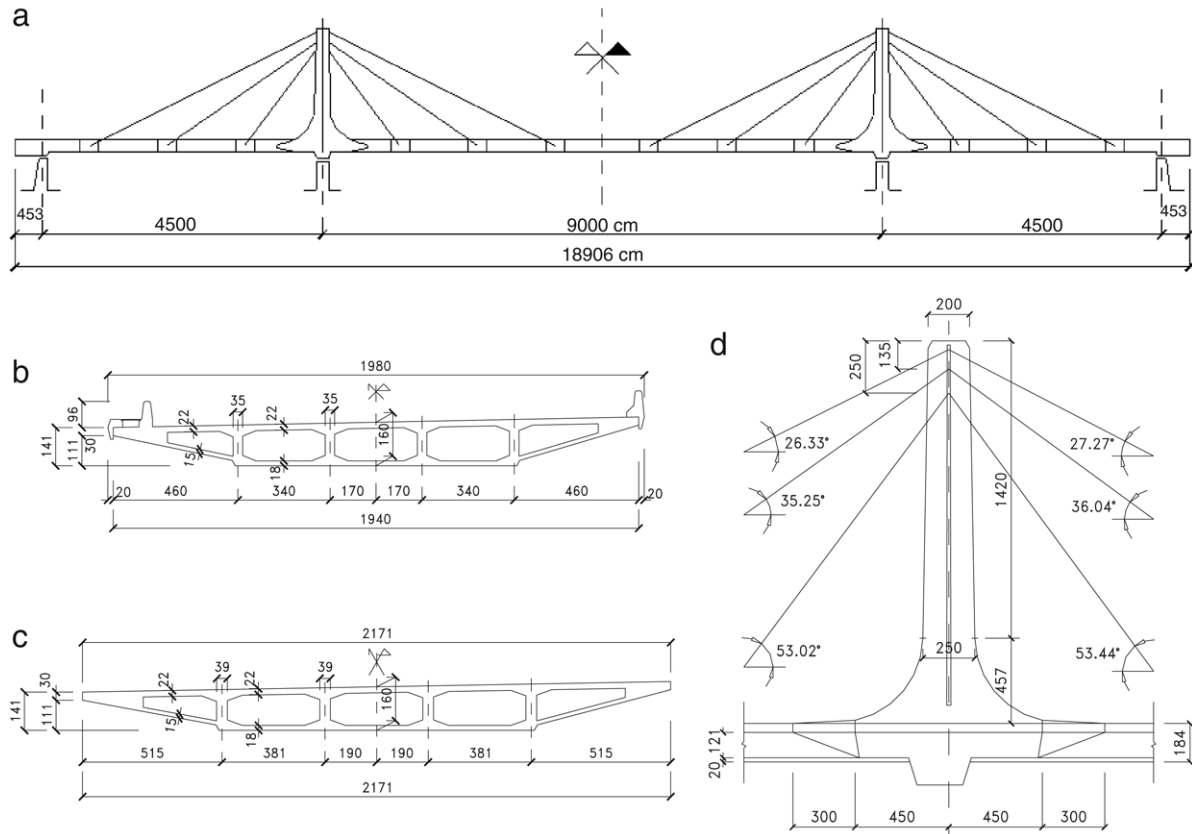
Certosa cable-stayed bridge. (a) Main dimensions of the bridge. (b–c) Main dimensions of the bridge deck: (b) straight cross-section; (c) skewed cross-section. (d) Main dimensions of the pylons.
